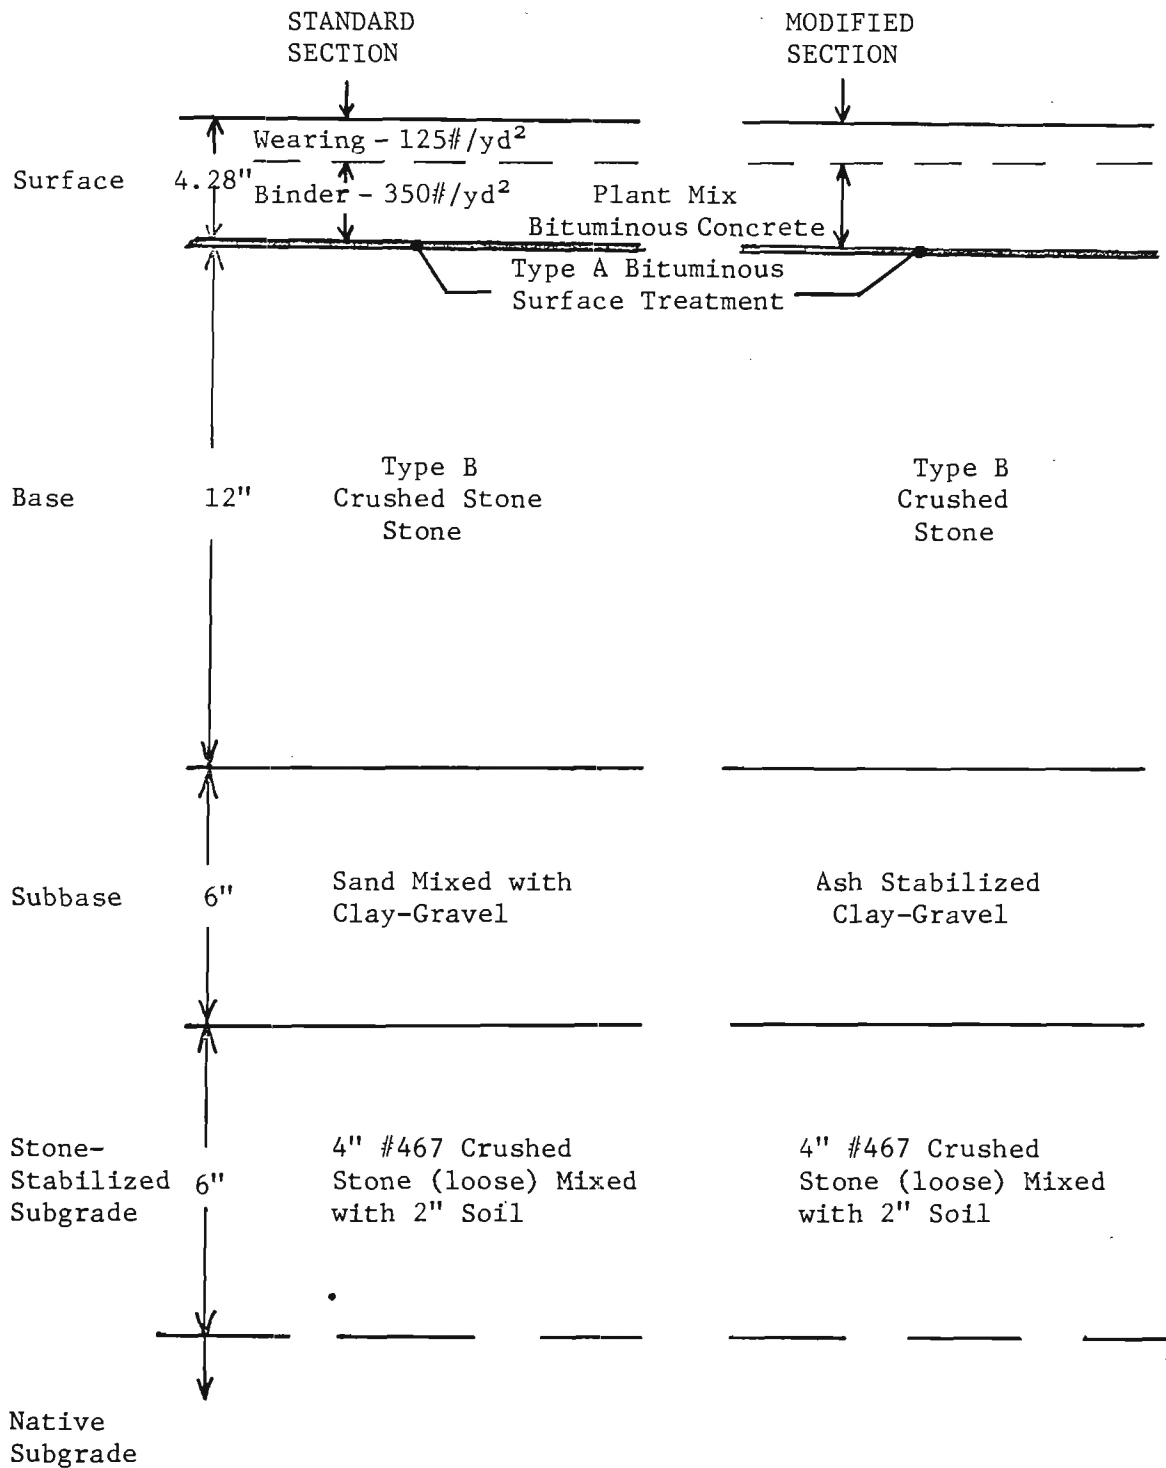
Standard and Modified Pavement Sections - Wilson Brothers Construction Company.
